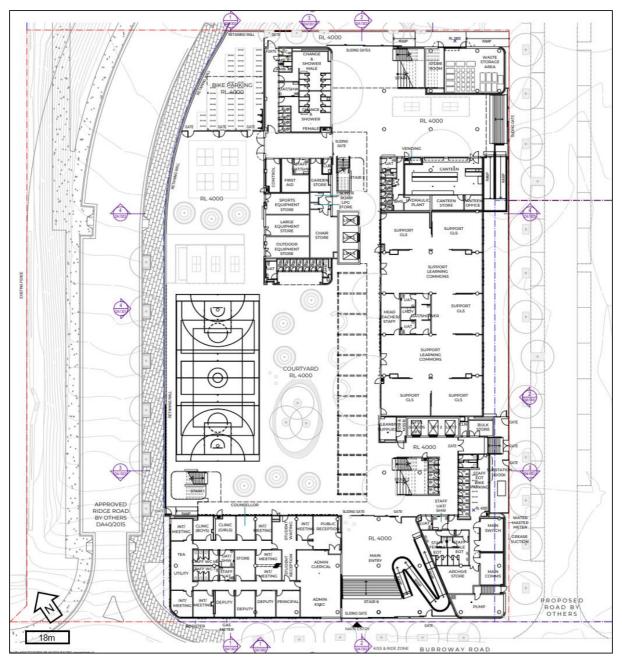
| Amended development - ground floor plan (Source: Applicant's AR 2022)
